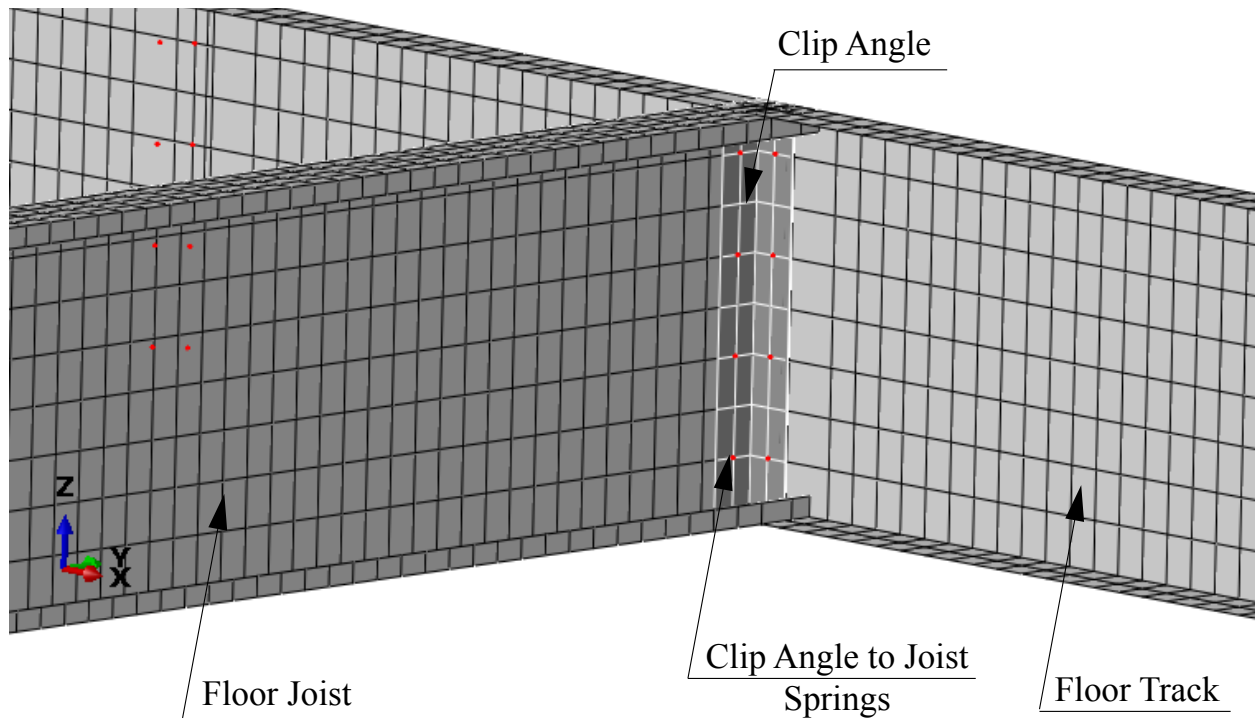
Finite element mesh for joist to track clip angles with attachment points for screw fasteners (spring element locations) shown in red
